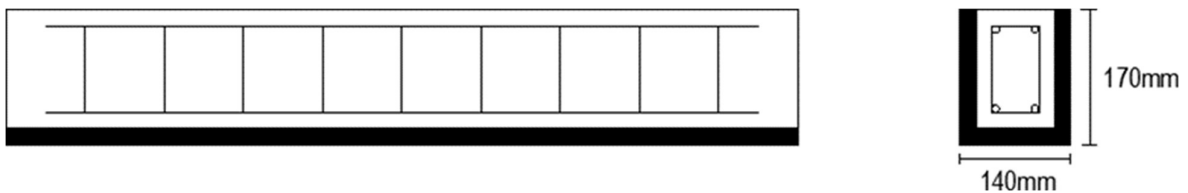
Longitudinal and Cross Section of Retrofitted Beam (U Rapped)
